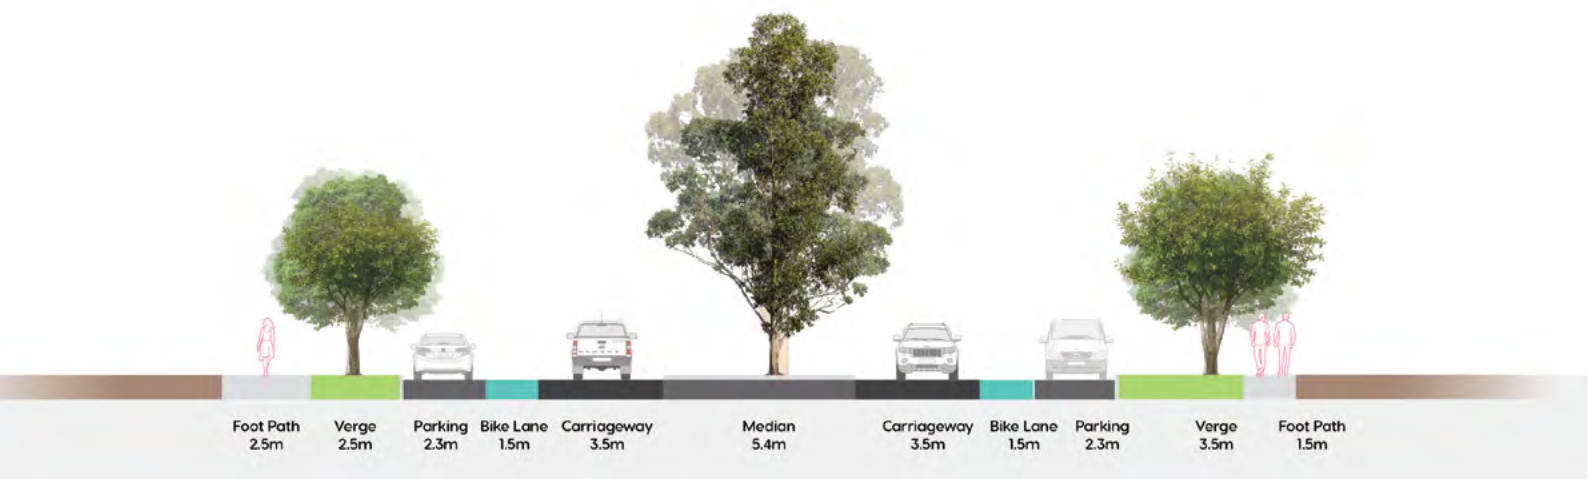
Proposed upgrades in Urquhart Street - Typical Section
